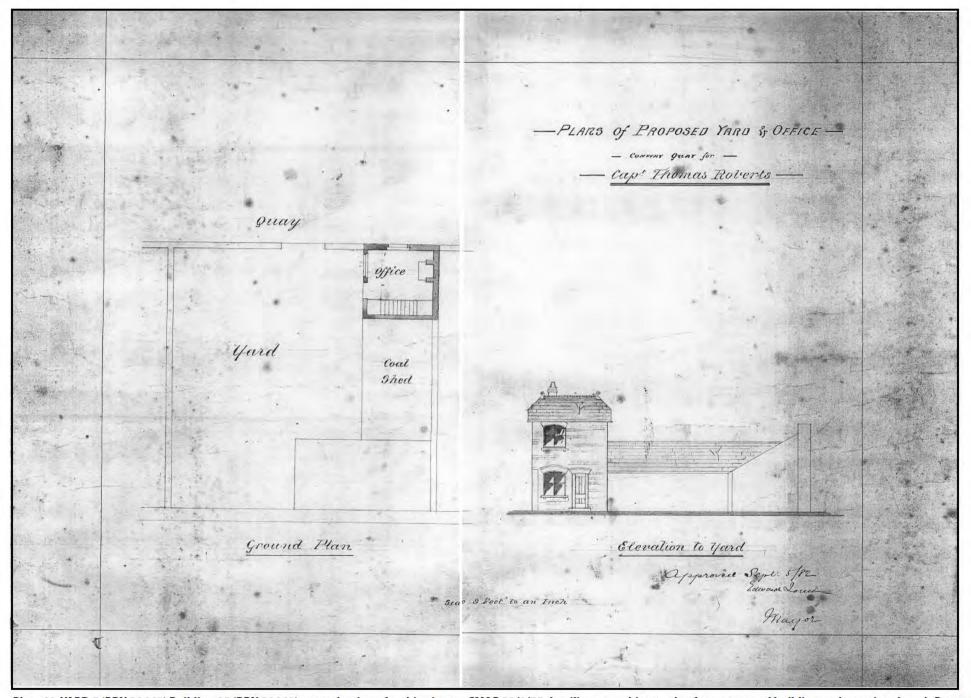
YARD 5 (PRN 30468) Building 05 (PRN 30469): reproduction of archive image CM&P 23/1/55 detailing an architects plan for a proposed building and associated yard. Proposed building was constructed as building 05 (PRN 30469) within the quay. The plan also shows a coal shed (Building 15, PRN 30471) against the NW elevation of cross wall C, running from the rear of Building 05 to another shed (Building 16, PRN 30472) built against the town wall. By 1939 there is no mention of "Captain Thomas Roberts" in the Kelly's Street Directory, but there is an "Edwards Coal Merchant" listed next to Higginbottom's, who did not take over until the 1950's (pers. comm. P. Higginbottom), so it seems likely that Edwards took over the coal yard from Roberts, which was subsequently occupied by Higginbottom, who ceased business in 1982. No regular use is recorded for the yard after this date.
